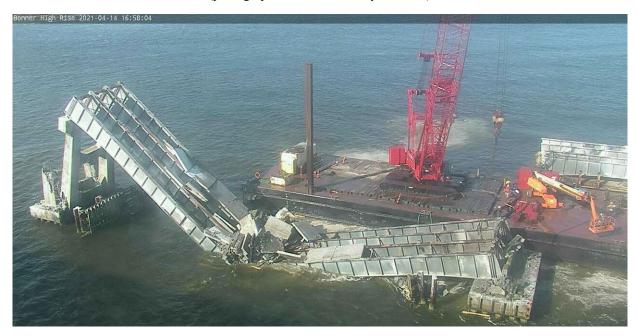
Collapsed steel girders in Span 145 (photographed on 4/14/2021 by NCDOT)
